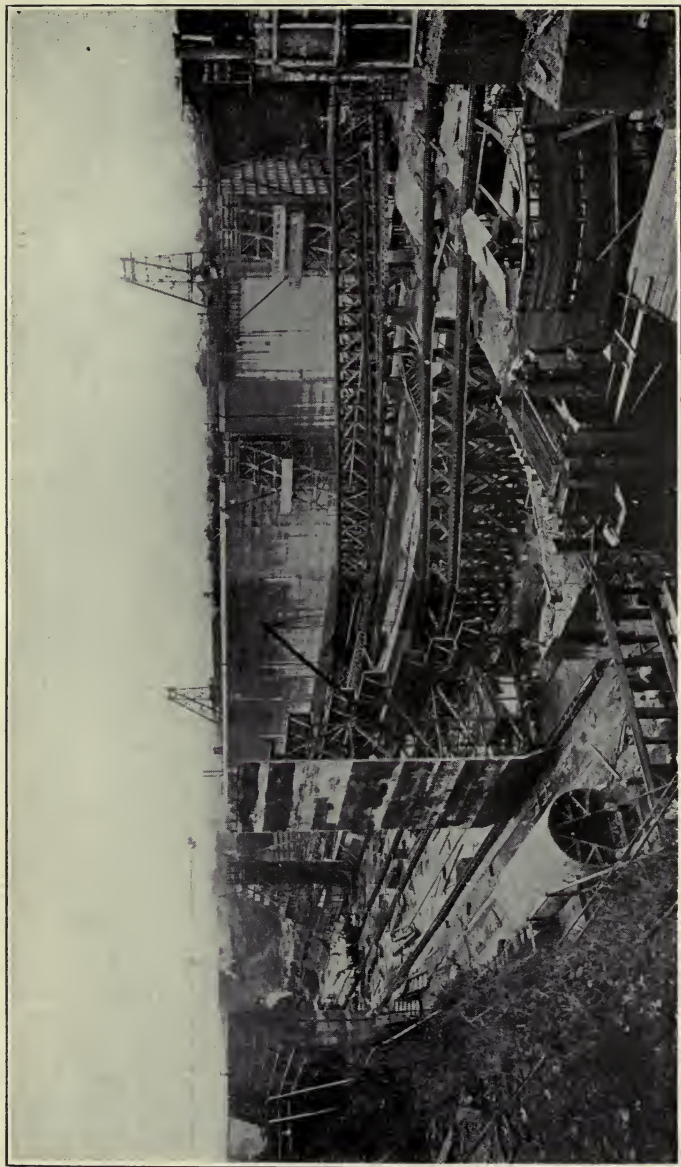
STEEL FORMS, GATUN LOCKS.
